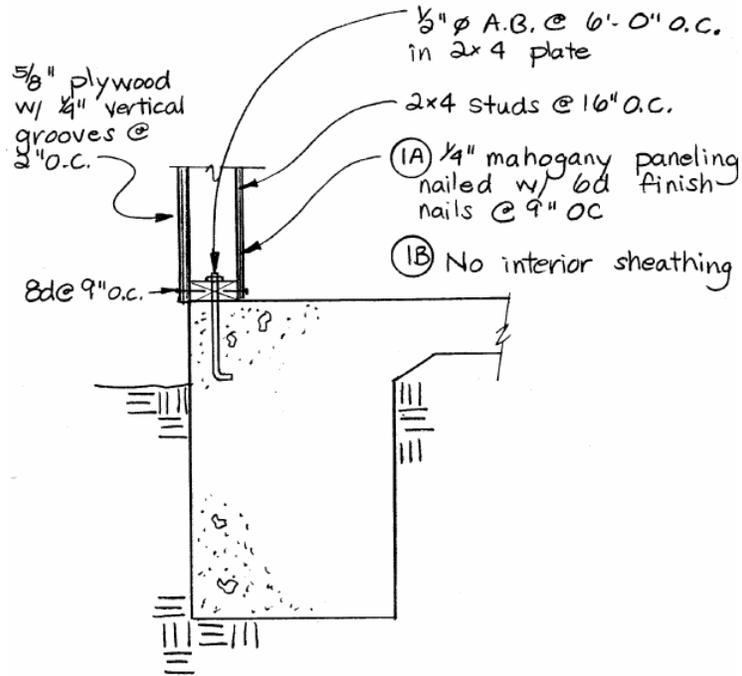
Index building 3 exterior wall footing (detail 1-S2)
